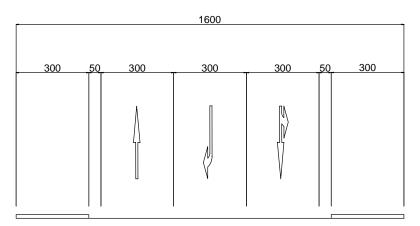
Typical Cross Section of Junction (A-A)
